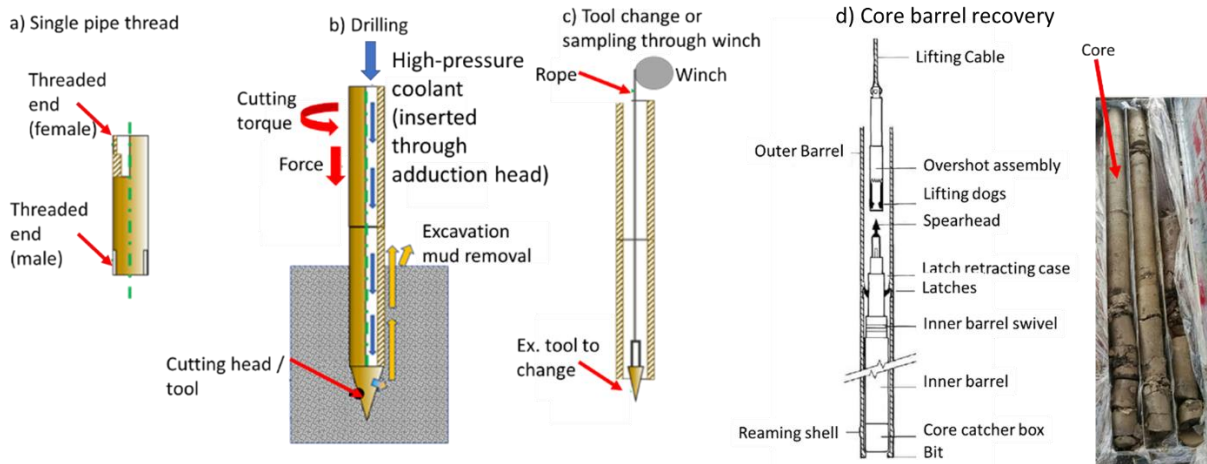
Single threaded tube (a), tubes assembled during drilling (b), tool change or sampling through wireline winch (c) and core barrel recovery (d) [1].
